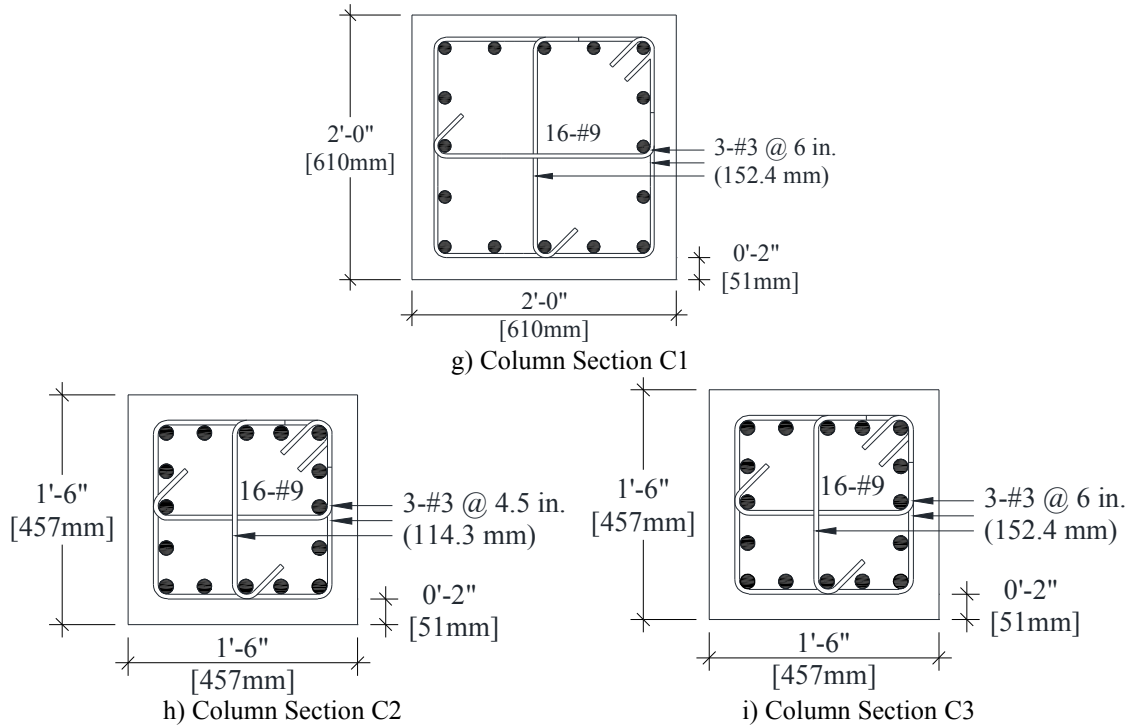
and 4-13 show the detailing of the six-story SMRF. The member geometry and reinforcement are listed in Table 4-4. Two identical column sections but with different transverse reinforcement were assigned to each column.
